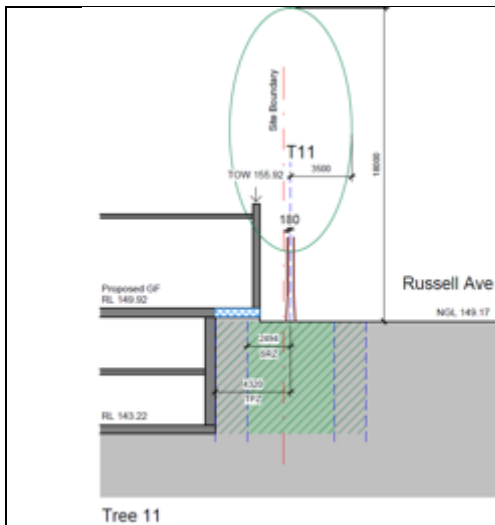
Cross section Tree 11 – construction works including a suspended slab (couter level) retain existing soil level.
